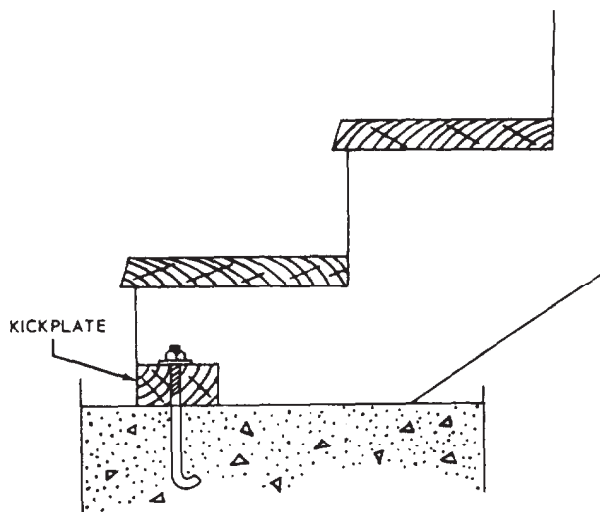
Kickplate for anchoring stairs to concrete.
